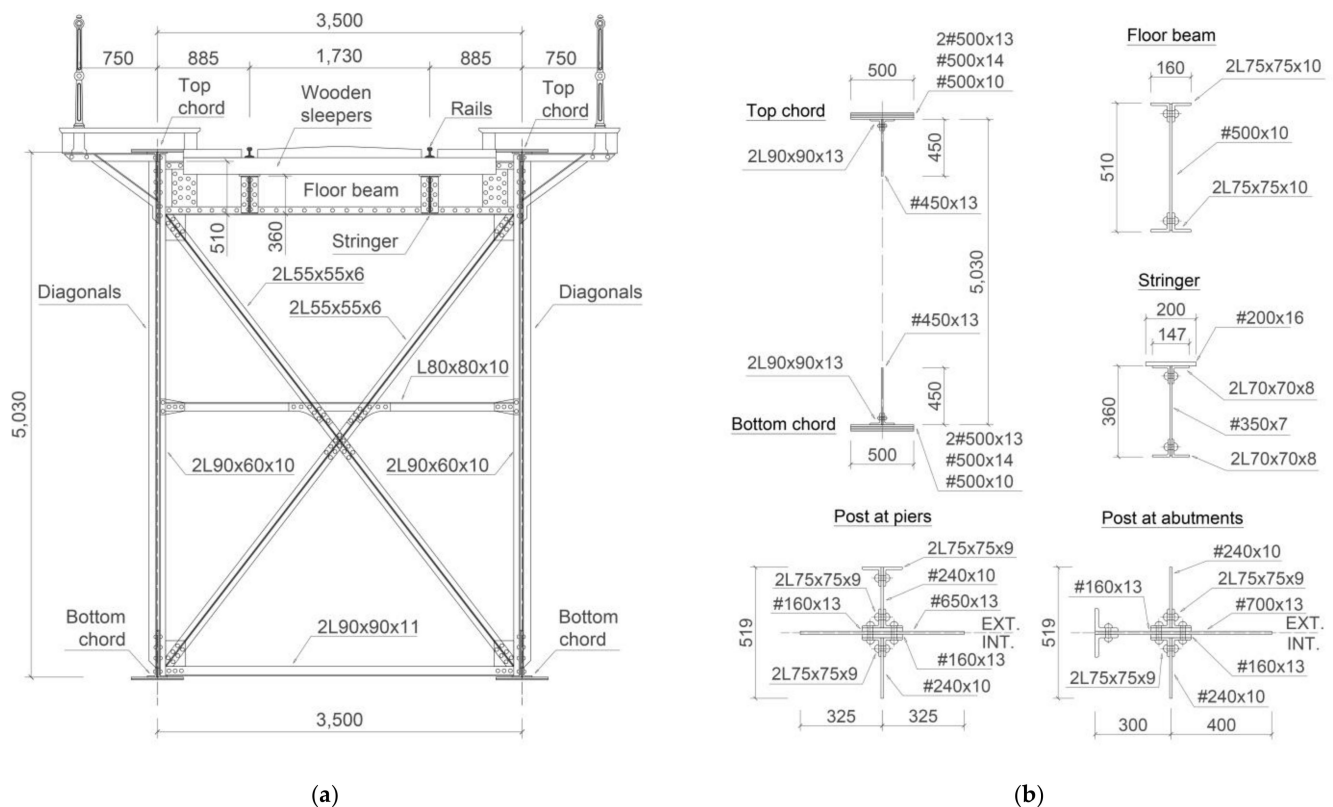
Redondela Bridge drawings: cross-sections (all dimensions in mm). (a) Bridge cross-section. (b) Element cross-sections.
